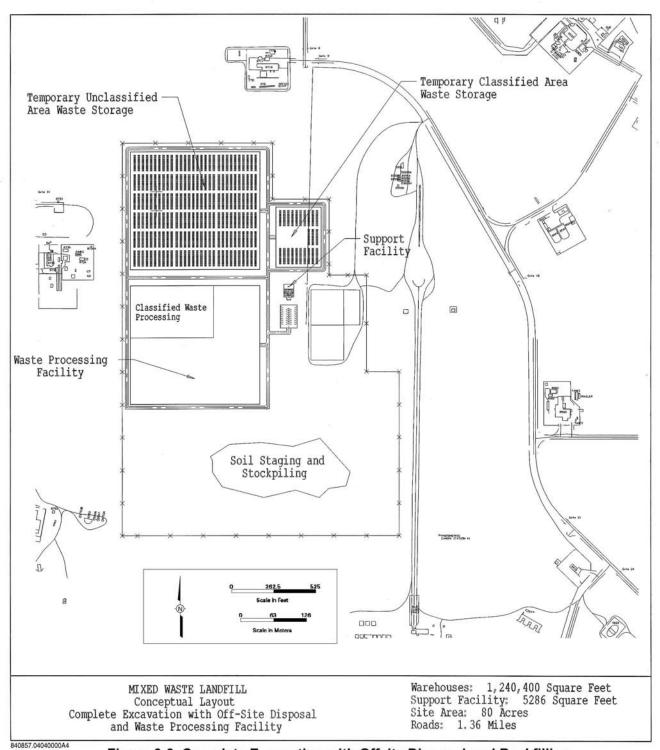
Complete Excavation with Offsite Disposal and Backfilling
